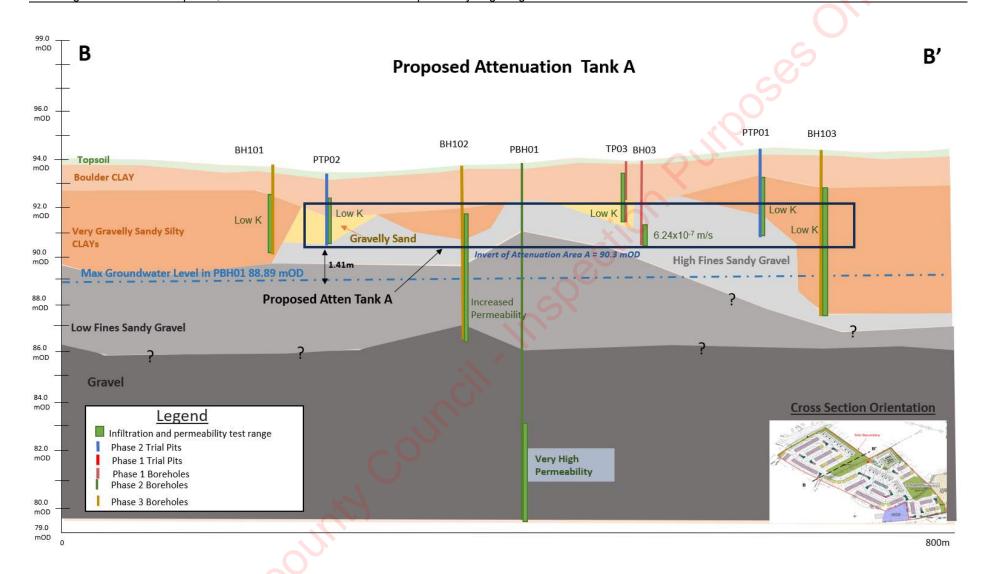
Proposed Attenuation Tank A Cross Section B – B'
